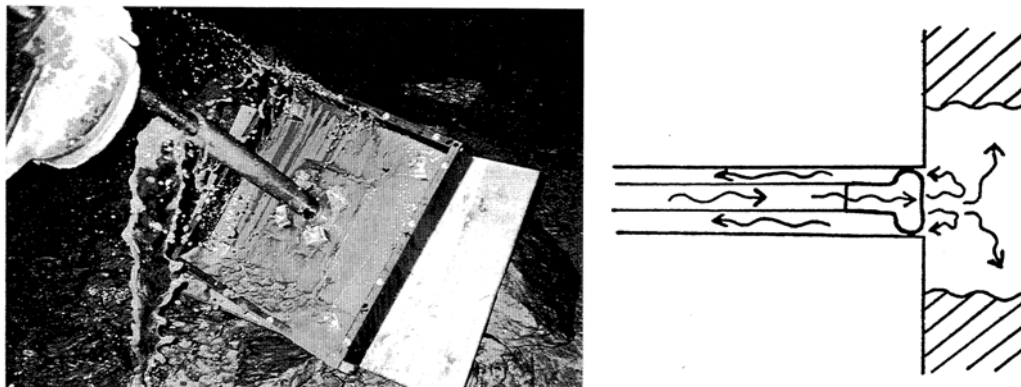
Equipment and principle layout for testing of grout flushing resistance, Johansson (1997).
